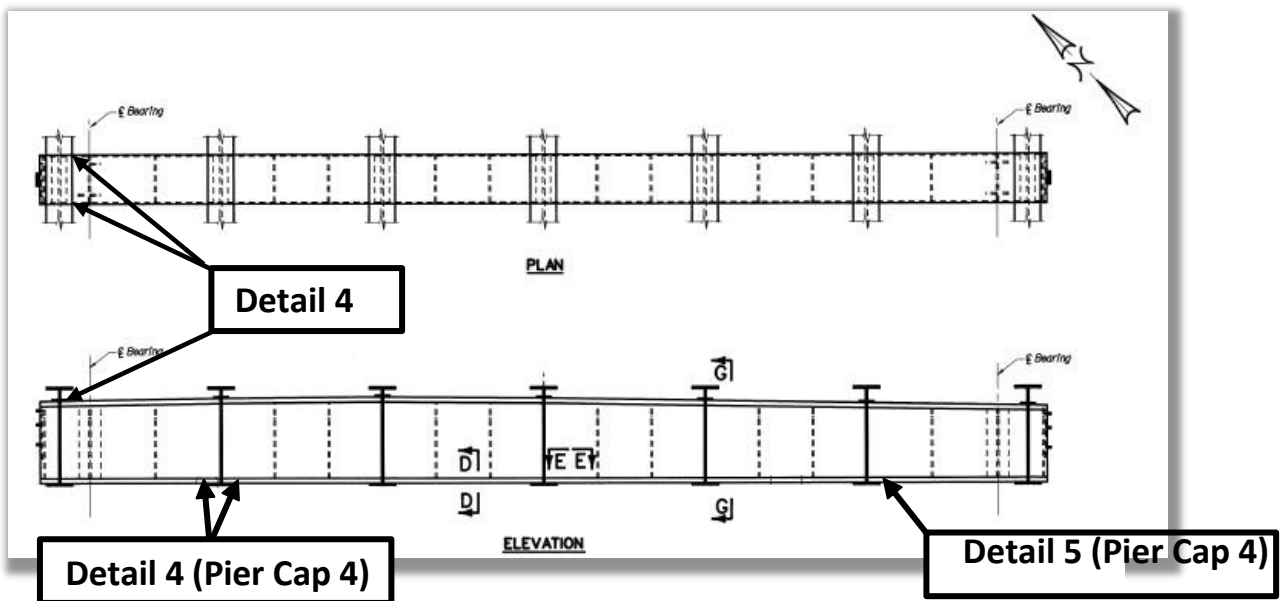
Plan and elevation of Pier Caps 3 & 4 with Fatigue Prone Details
